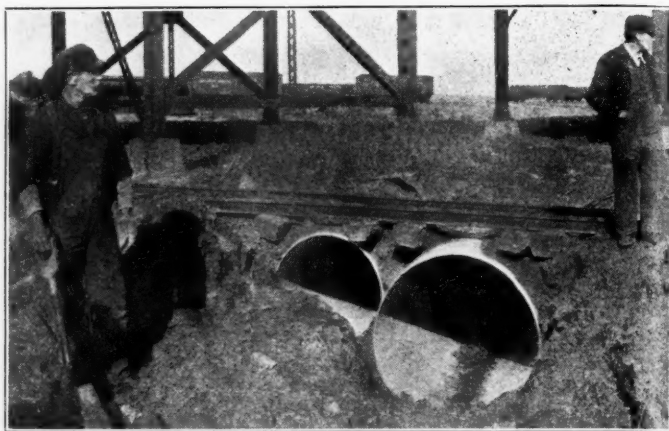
American Ingot Iron Culverts in Loose Sand, for Test. St. Louis-Kansas City Electric Railroad.
